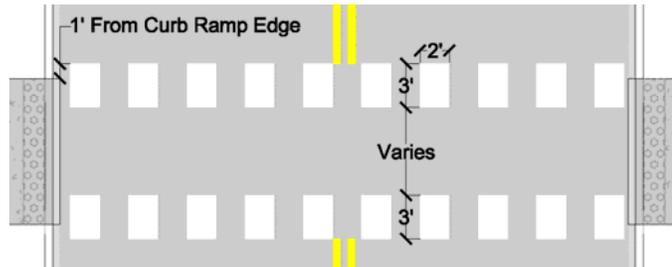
Shared Use Pathway Crosswalk Striping
